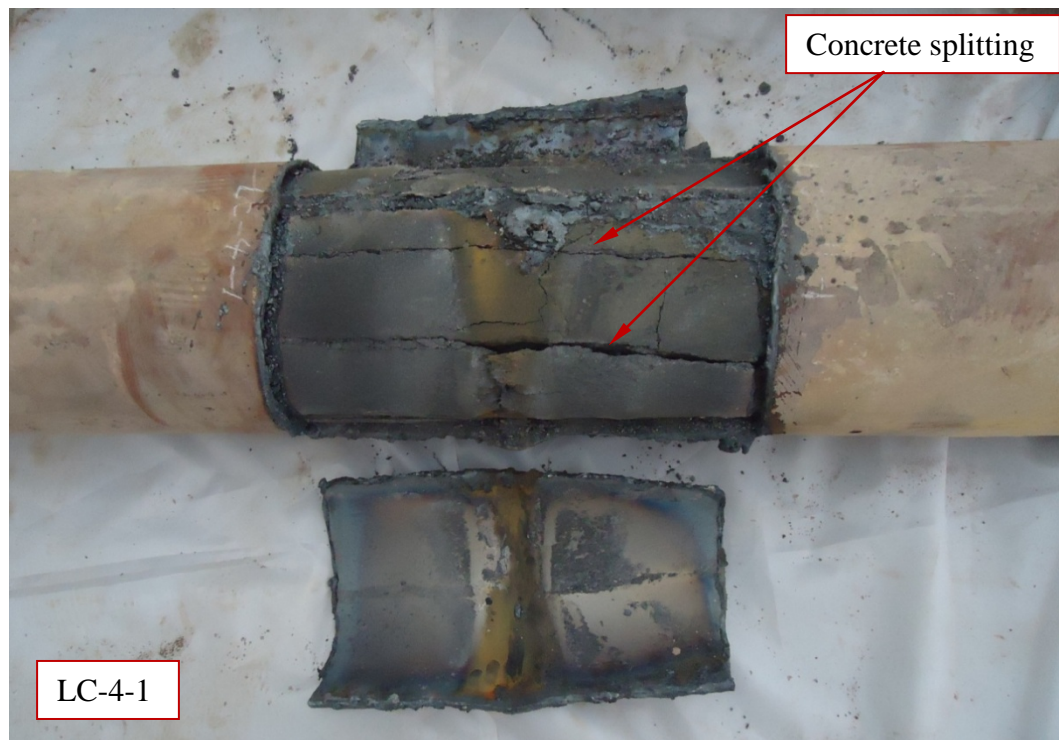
Longitudinal splitting of concrete by cross-sectional failure
